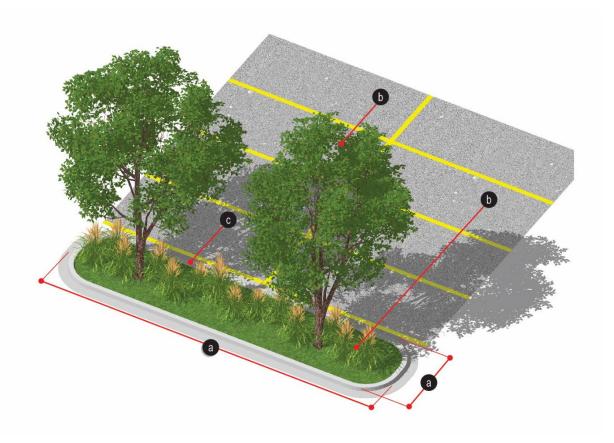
Off-Street Parking Area Landscape Standards in Rear of Building
